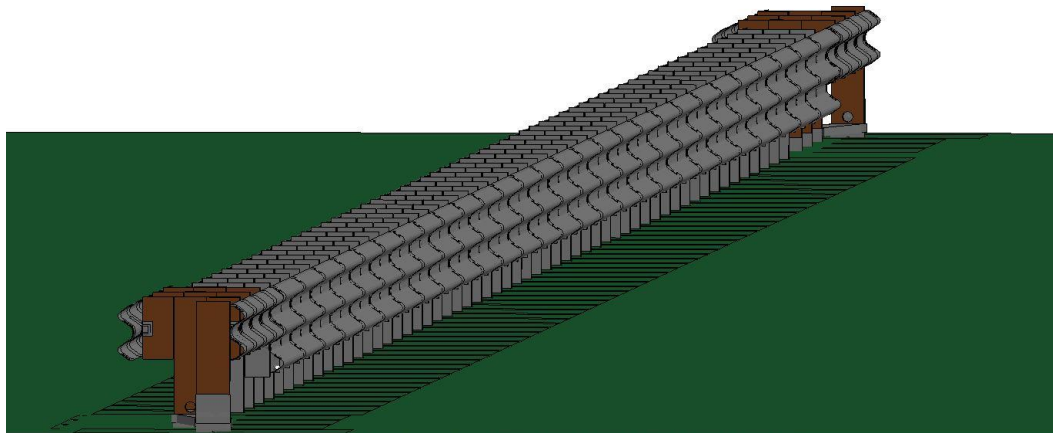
Full FE model of the double-faced 29-inch steel-blockout Thrie-beam guardrail.
